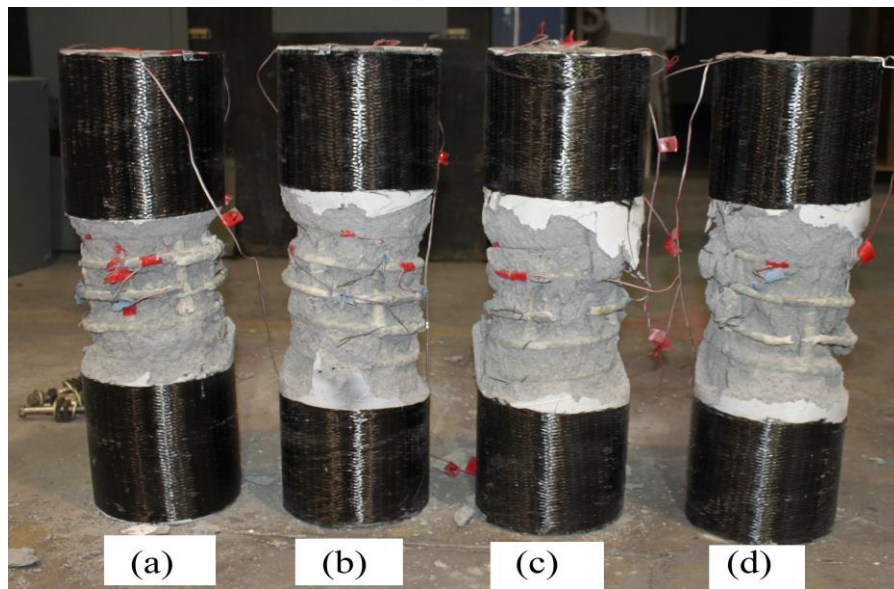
Failure of all four concrete columns (a) 6LR#3@1.5; (b) 6LR#3@1.5; (c) 4LR#3@1.5; (d) 4LR#3@1.5.
